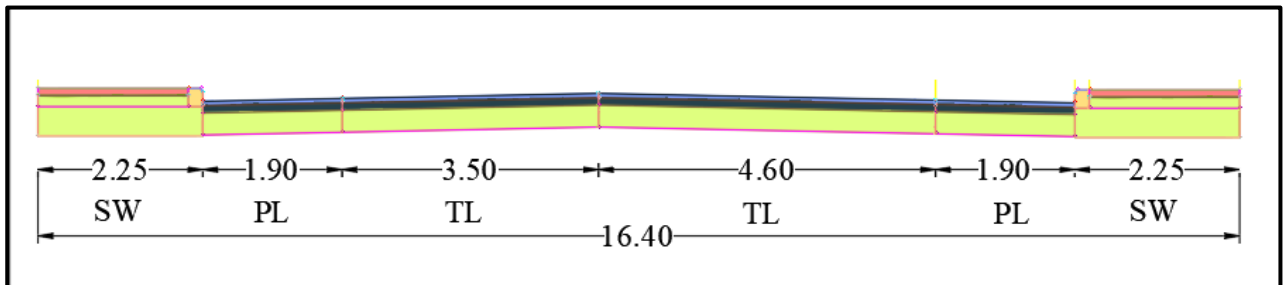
At Gift Corner Section No.3 Existing Cross Section
